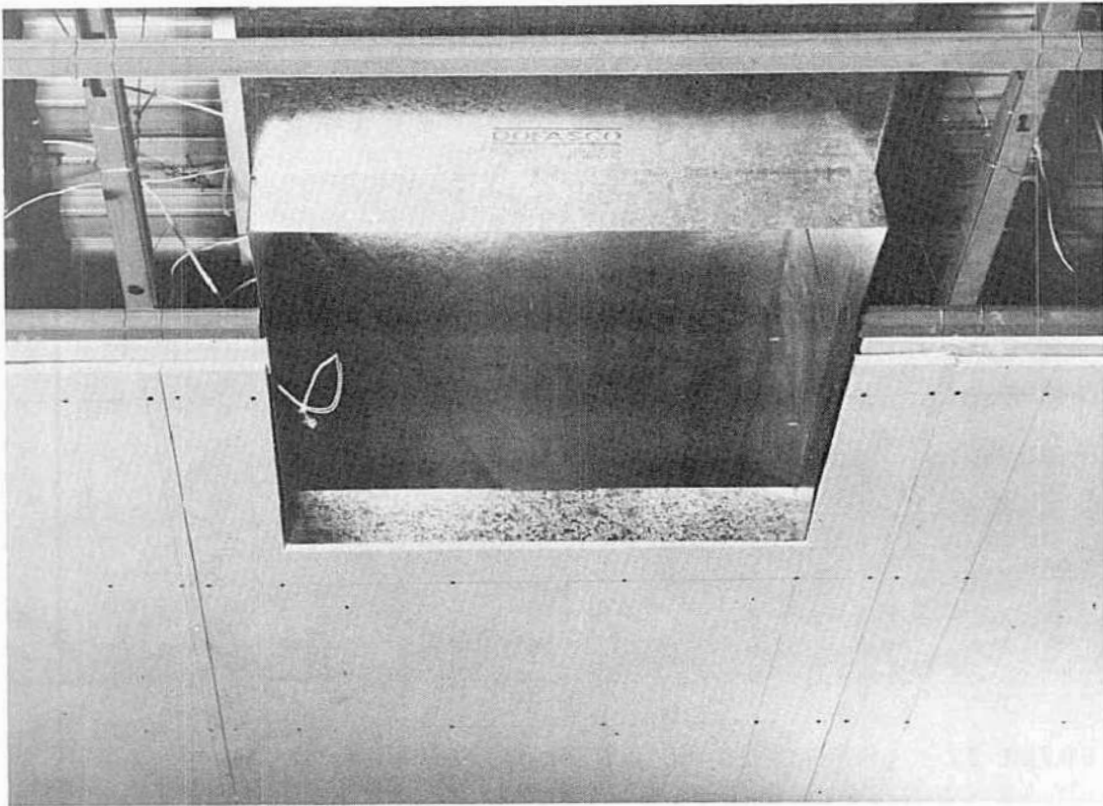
APPLICATION OF GYPSUM BOARD (ASSEMBLY NO. 2)
